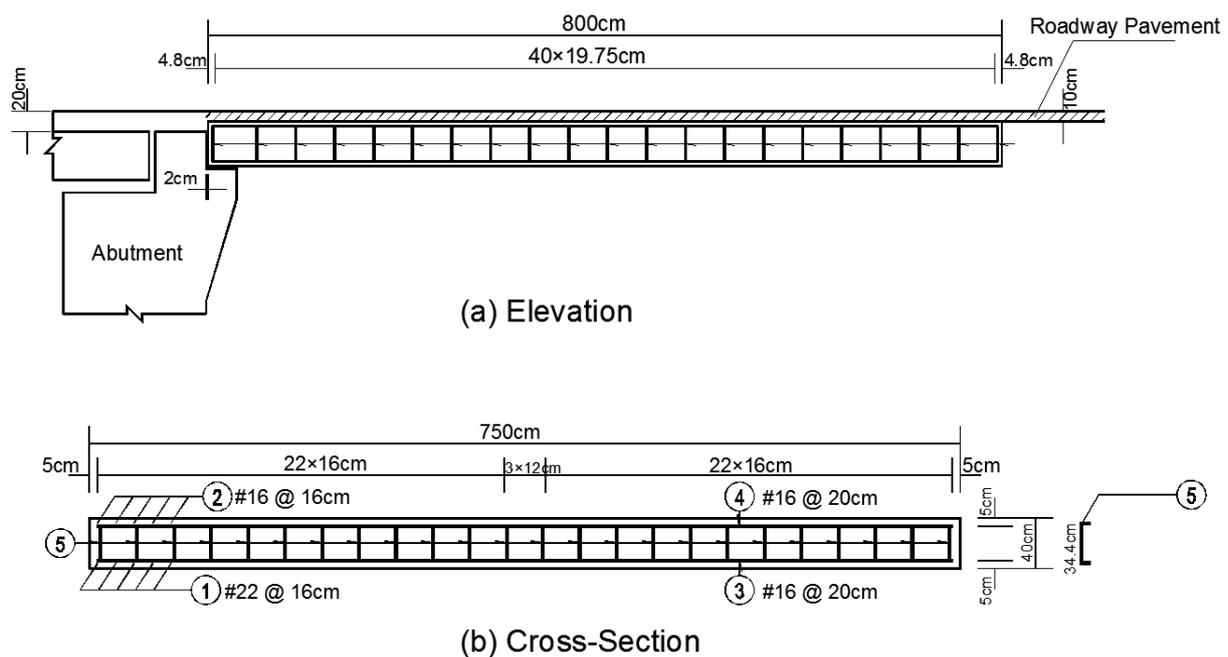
Details of the approach slabs used in Ningbo, Zhejiang
